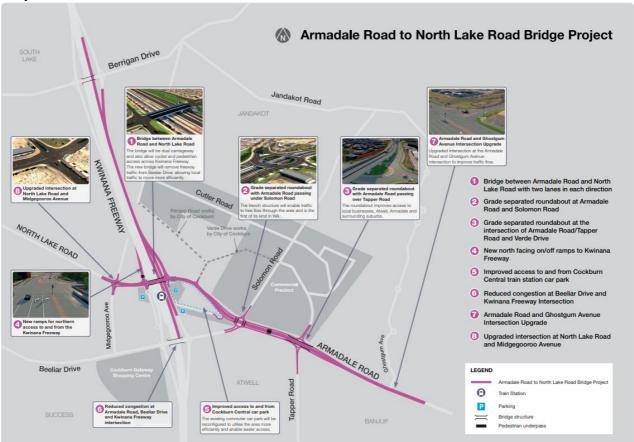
Armadale Road to North Lake Road Bridge Project overview map © Main Roads WA
